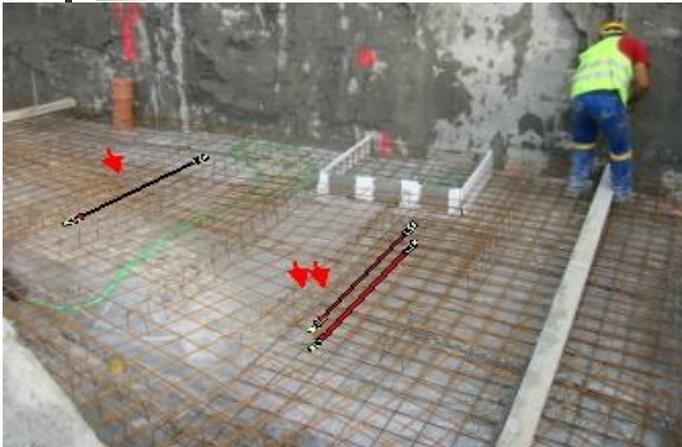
Bridge stack being prepared for destructive test, sensors installed on rebars.
